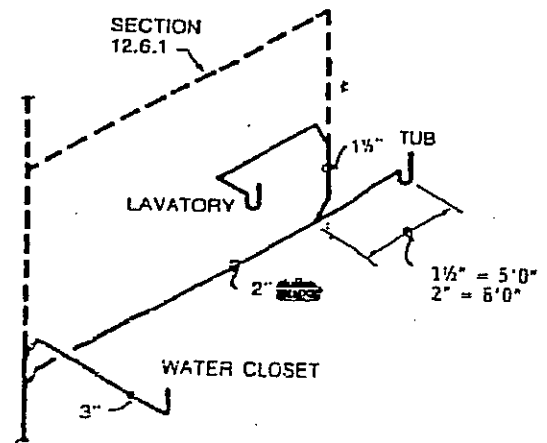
AN EXAMPLE OF A VENTED BATHROOM GROUP SINGLE STORY OR TOP FLOOR OF MULTIPLE STORY STRUCTURE
